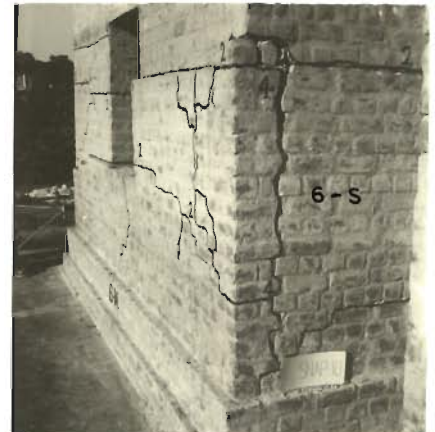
\_ A VERTICAL CRACK OPENING OF 50 mm AT SOUTH - WEST CORNER (MODEL 6)
